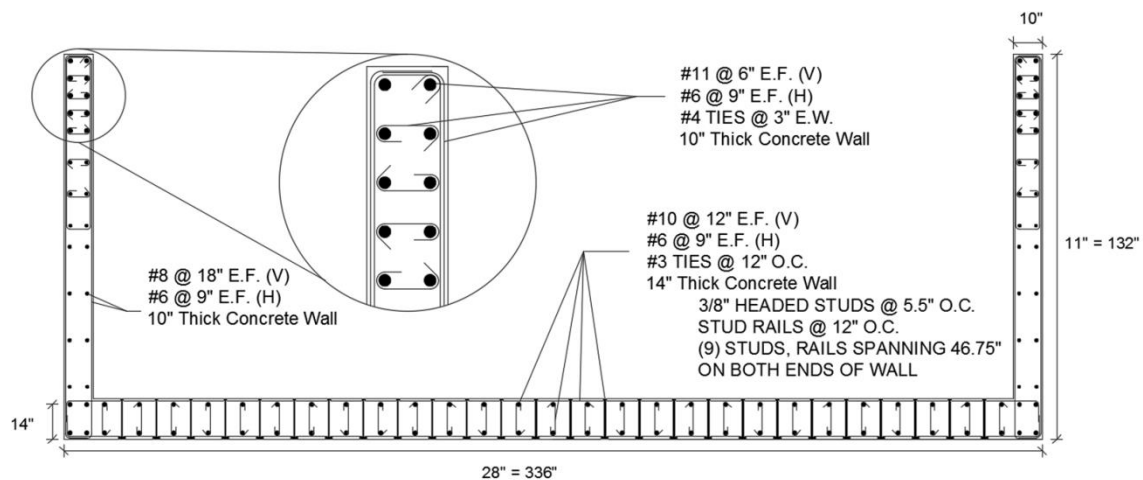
New Elevator/ Mech. Room shear wall cross-section at the ground floor level
